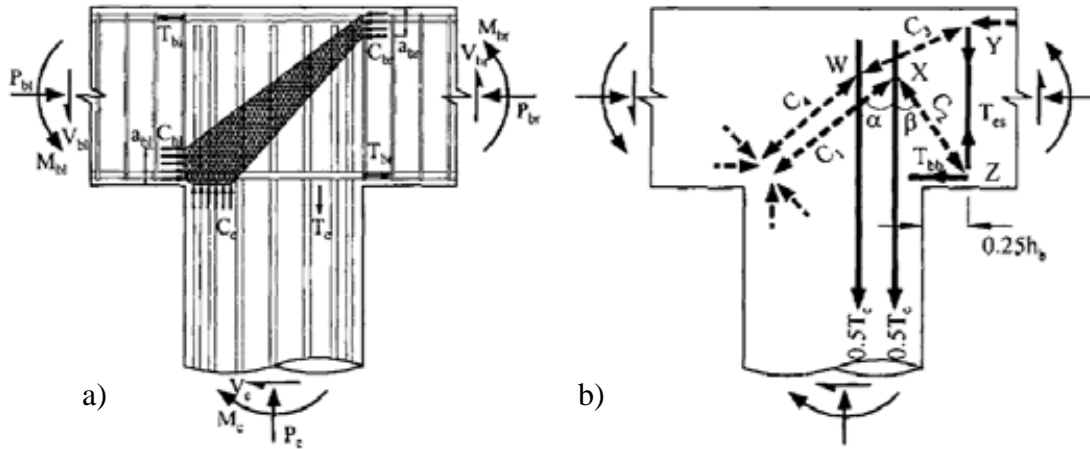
Strut-and-tie analysis for prestressed T-bridge joint : a) Idealised joint compression strut and b) external strut force transfer model [185].
